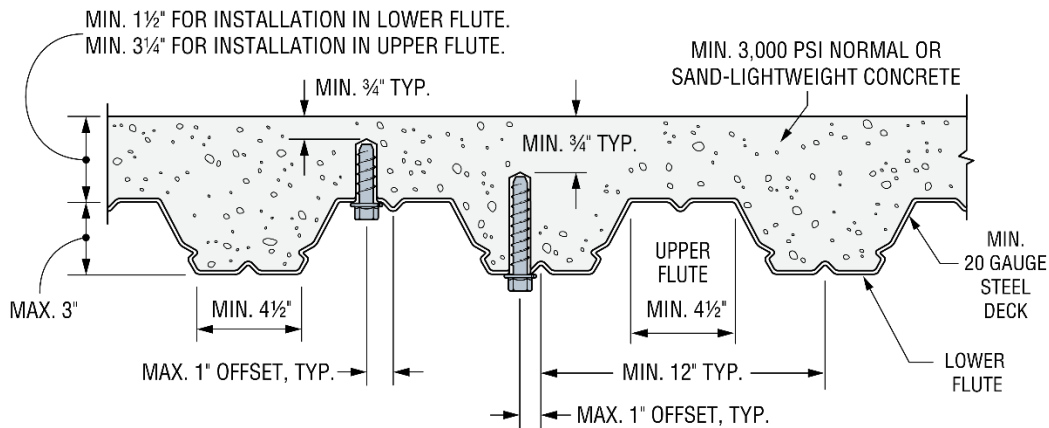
INSTALLATION OF 3/8-INCH AND 1/2-INCH SHANK DIAMETER SCREW ANCHORS AND ROD HANGERS INTO THE SOFFIT OF CONCRETE-FILLED PROFILE STEEL DECK FLOOR AND ROOF ASSEMBLIES (1 in = 25.4 mm)
